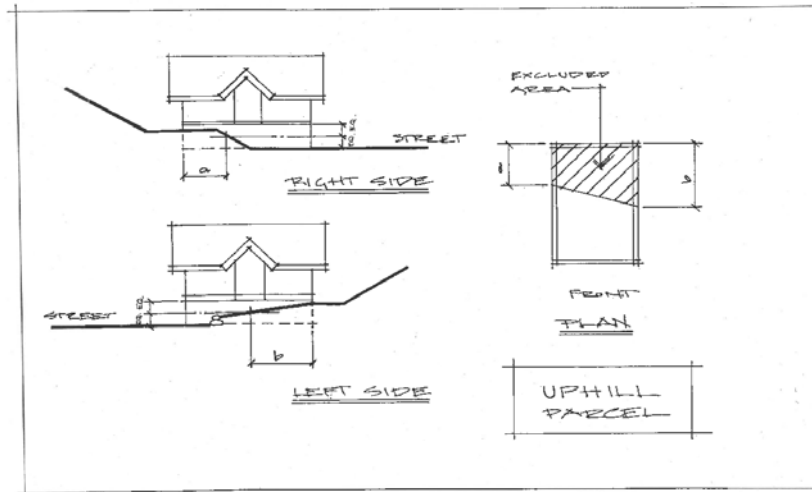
In-Ground Basement Floor Area for an Uphill Parcel
